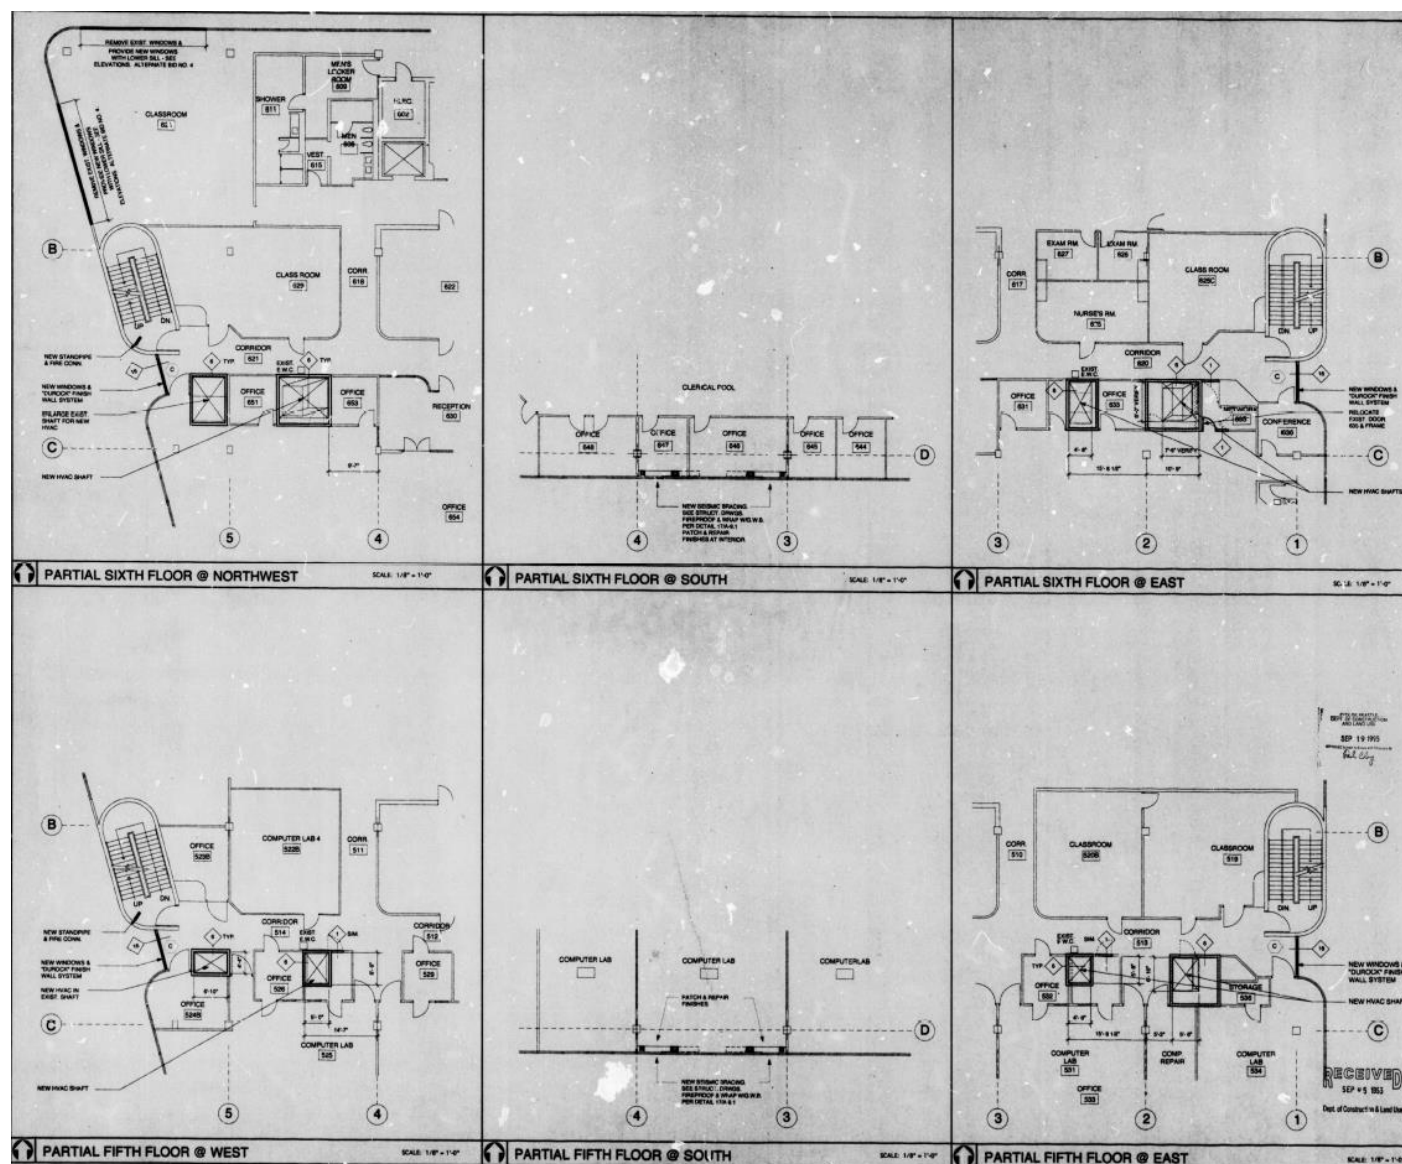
Partial Fifth and Sixth Floor Plans - 1996 Renovation, Johnson Architecture & Planning, 1995
